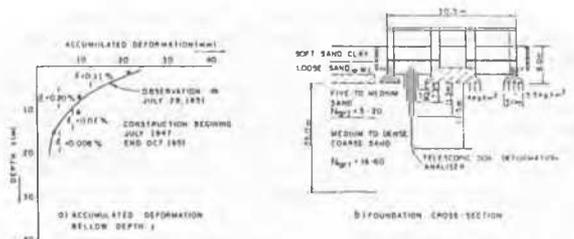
CBI-ESPLANADA BUILDING - GROUND CROSS-SECTION AND DEFORMATIONS
